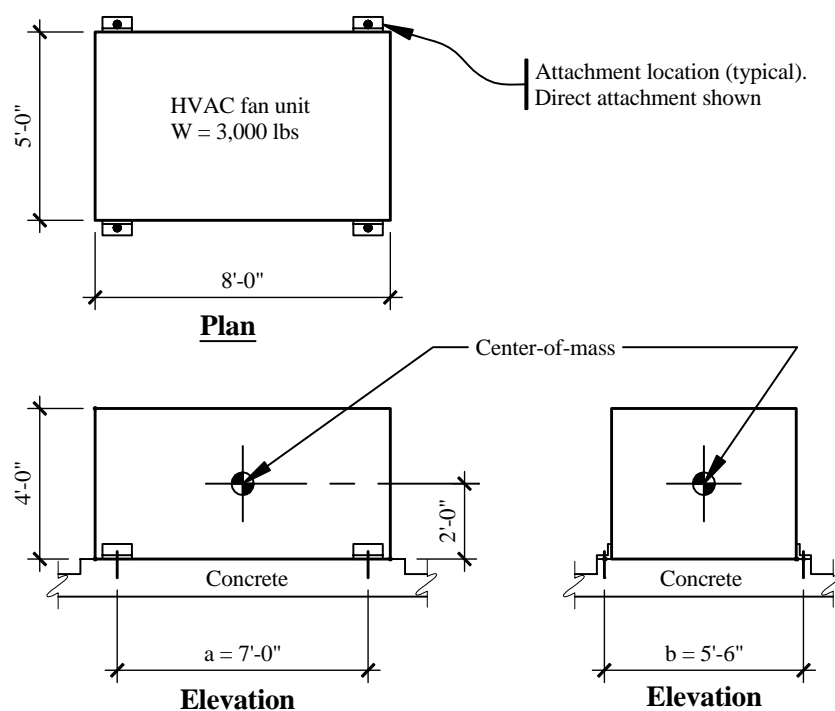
Air handling fan unit (1.0 ft = 0.3048 m, 1.0 lb = 4.45 N).
